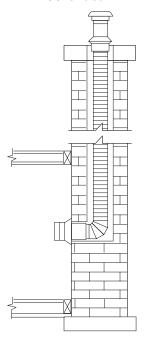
Typical Straight Installation with Listed Chimney Liner
